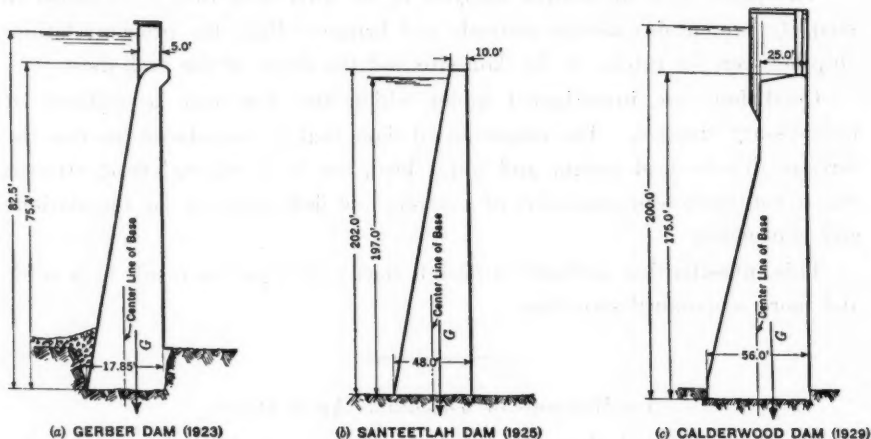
TYPICAL CROWN SECTIONS; GRAVITY ACTION NEGLECTED.
